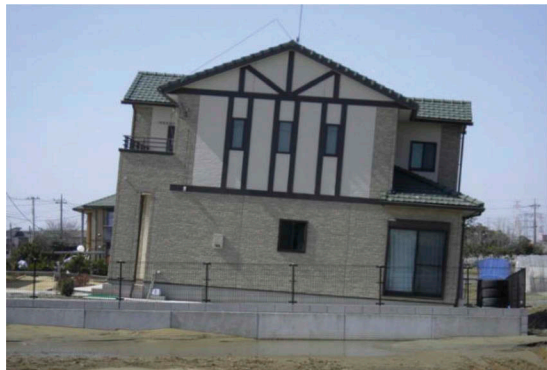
Tilting of house caused by subsoil liquefaction (Kashima, Ibaragi).
